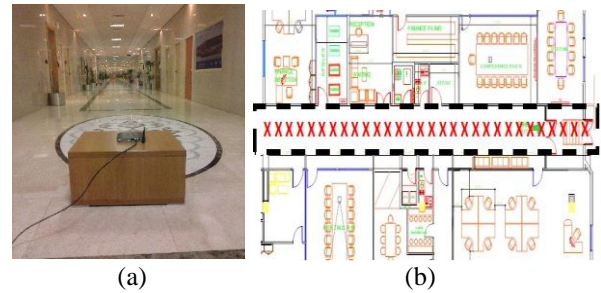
Corridor section of indoor commercial building: (a) transmitter and (b) structure layout.
